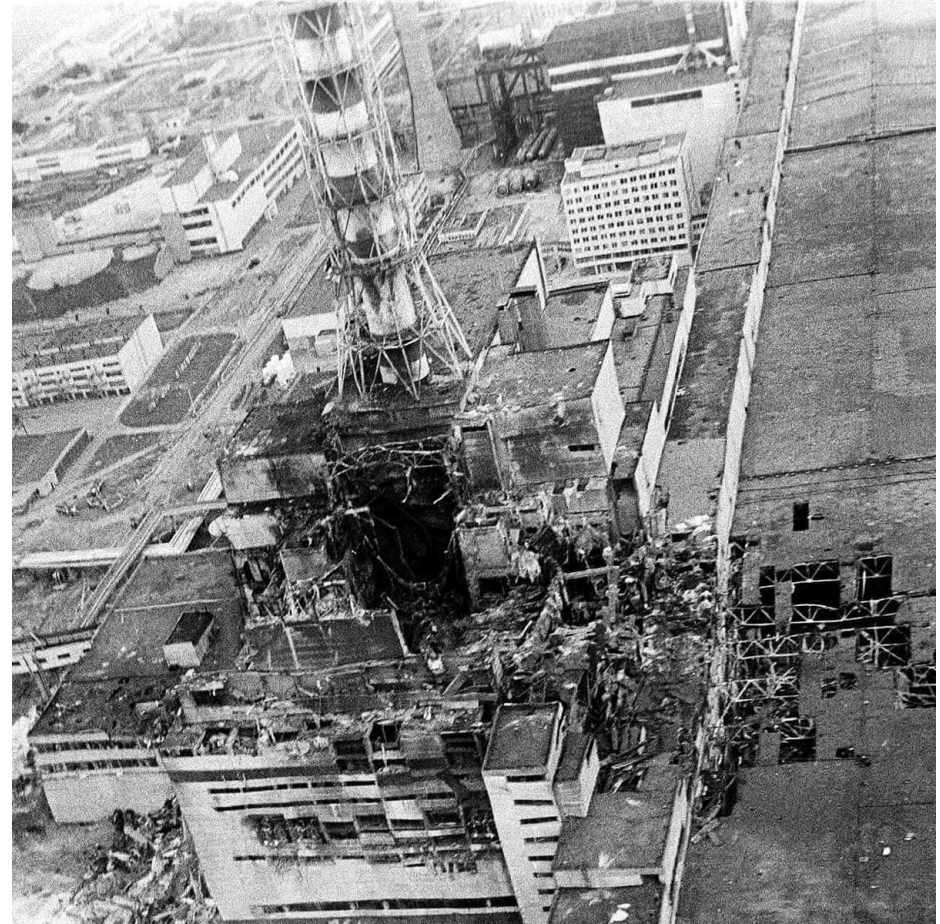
Cross-section view of damaged Unit 4 Chernobyl reactor building.
